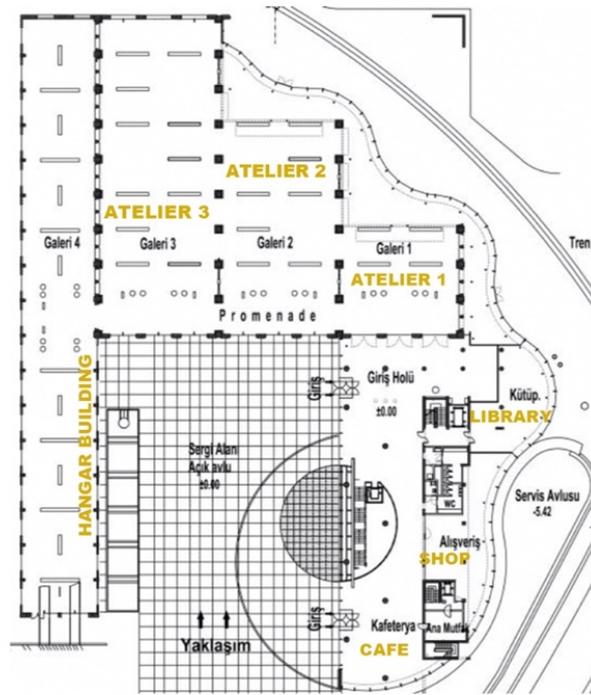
Plan scheme of the ground floor of CerModern, named by the author. (Source: Uygur Mimarlık Archive)
